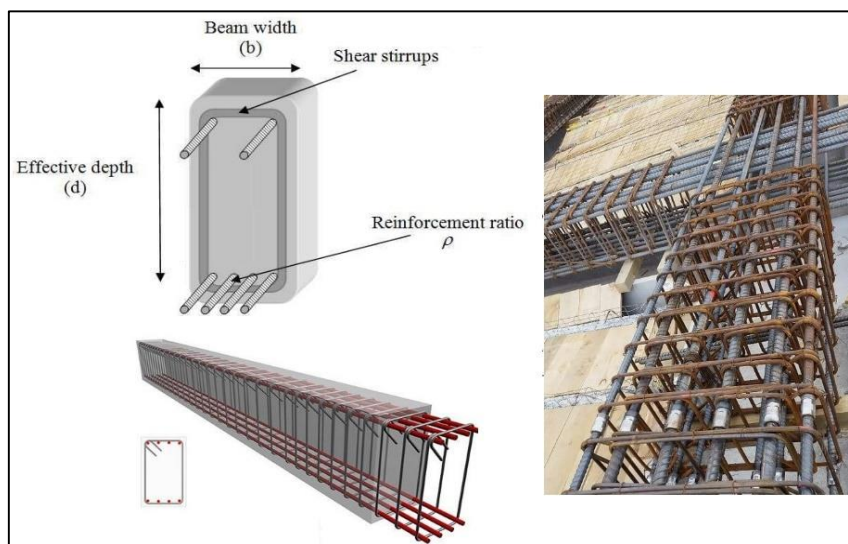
Maximum longitudinal spacing and transversal spacing of the legs
